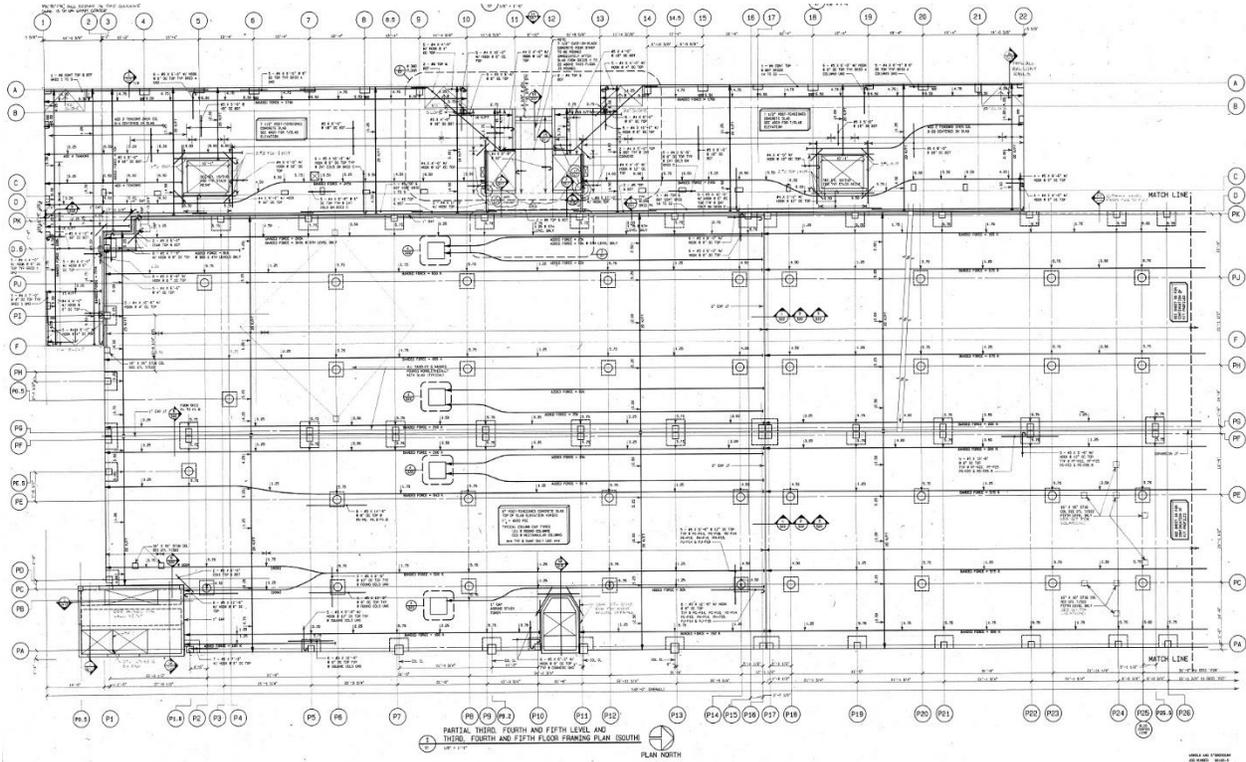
Plan view of southern half of a typical floor of the Church Street Parking Garage.
